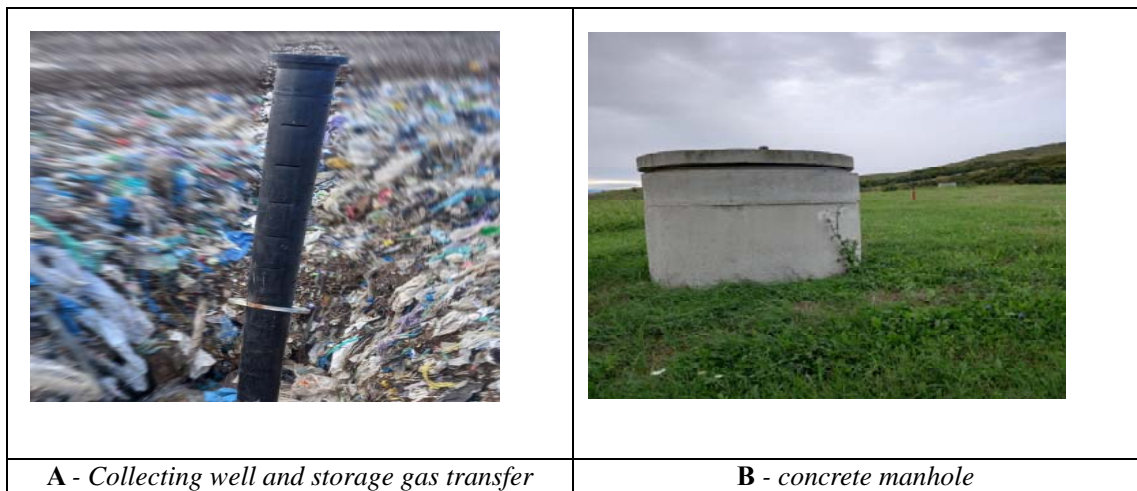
Collecting well and storage gas transfer, concrete manhole
